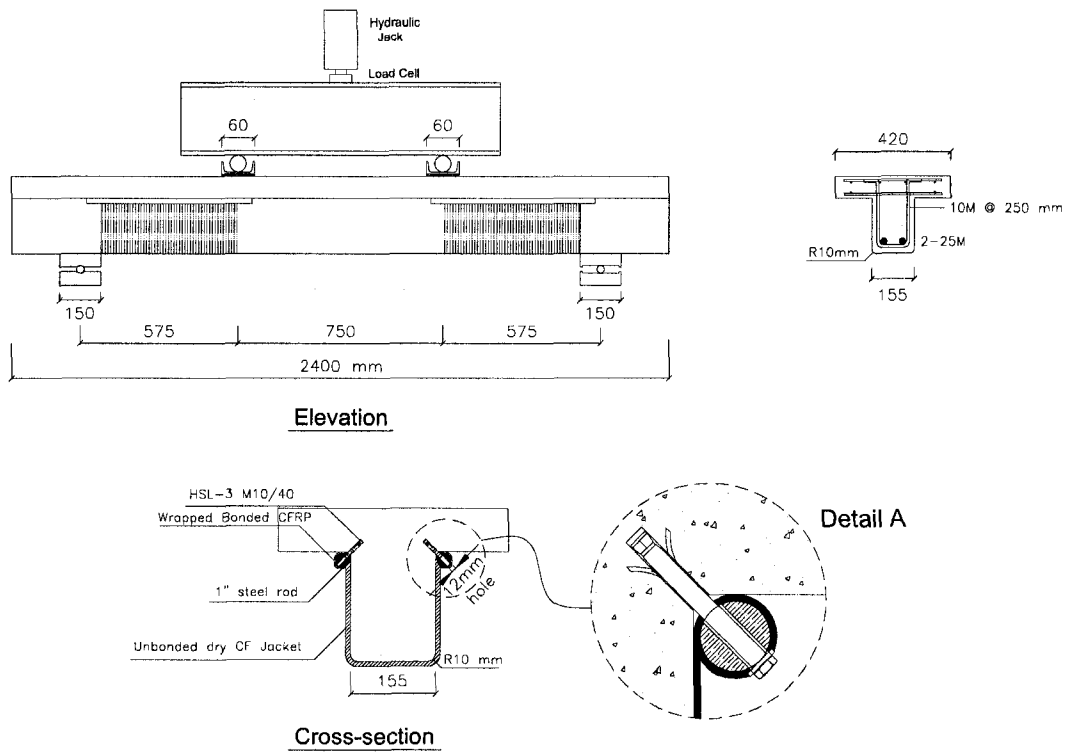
Layout of beam S-M-D strengthened using the anchored U-shaped dry CF jacket
